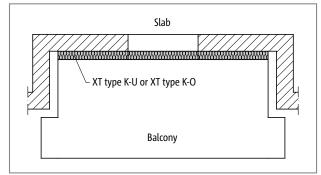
Schöck Isokorb[®] XT type K-U/K-O: Balcony with facade offset
